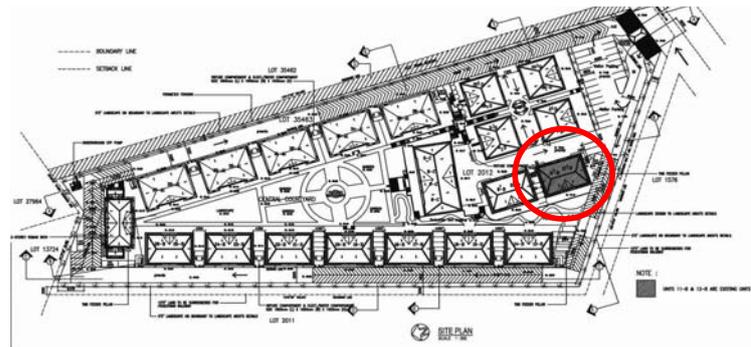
Site Plan - Whole development highlighting the location of unit modeled in study
